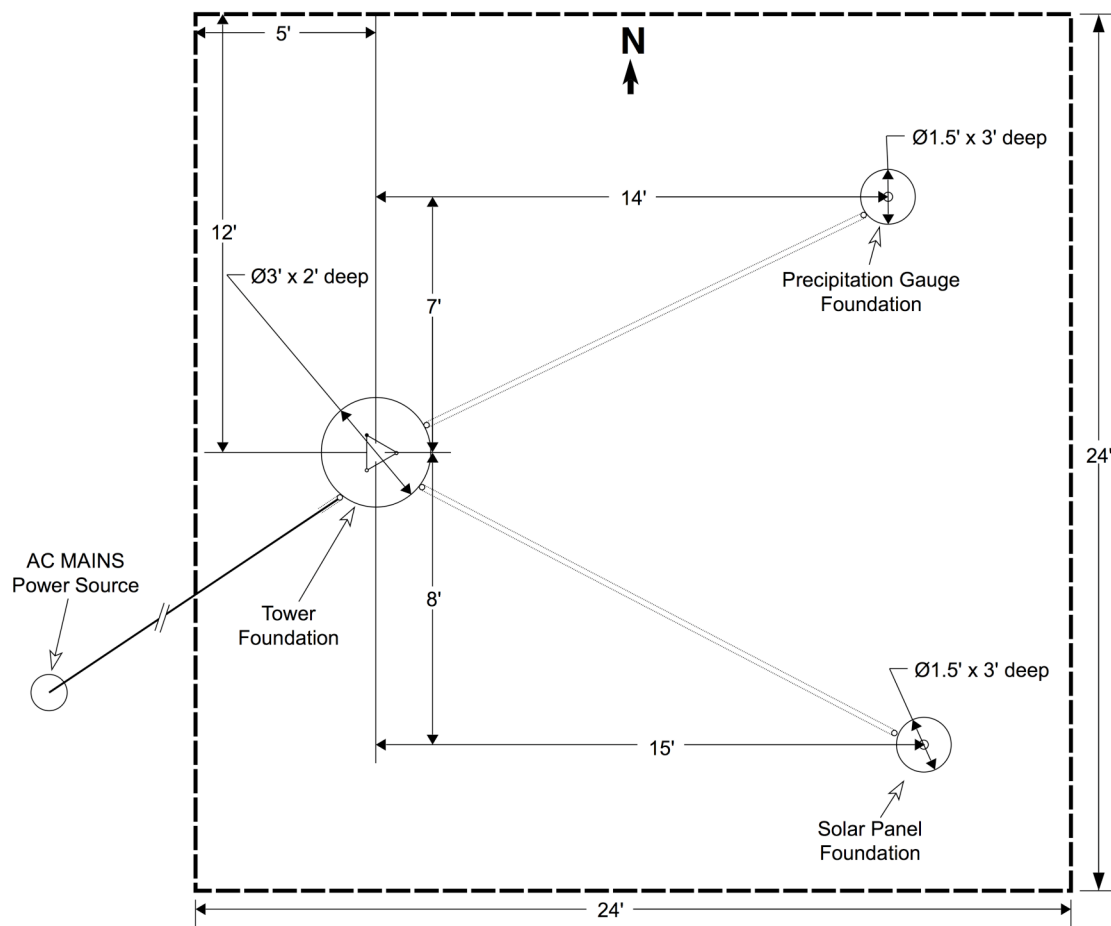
Plan view of a station plot that measures 24-by-24 feet showing foundation and conduit placement.
